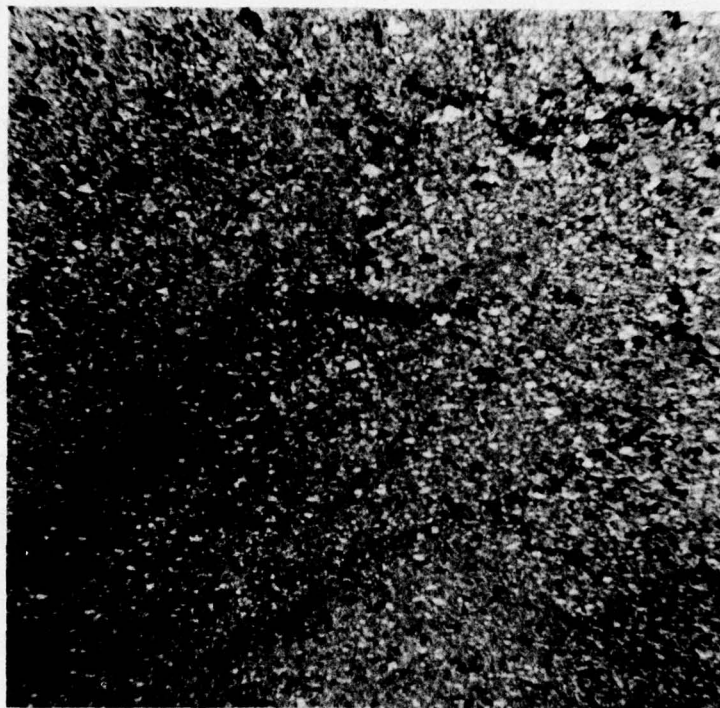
Shrinkage cracks in outside edges of runway (feature R8D), sta 10+00 to 113+00
